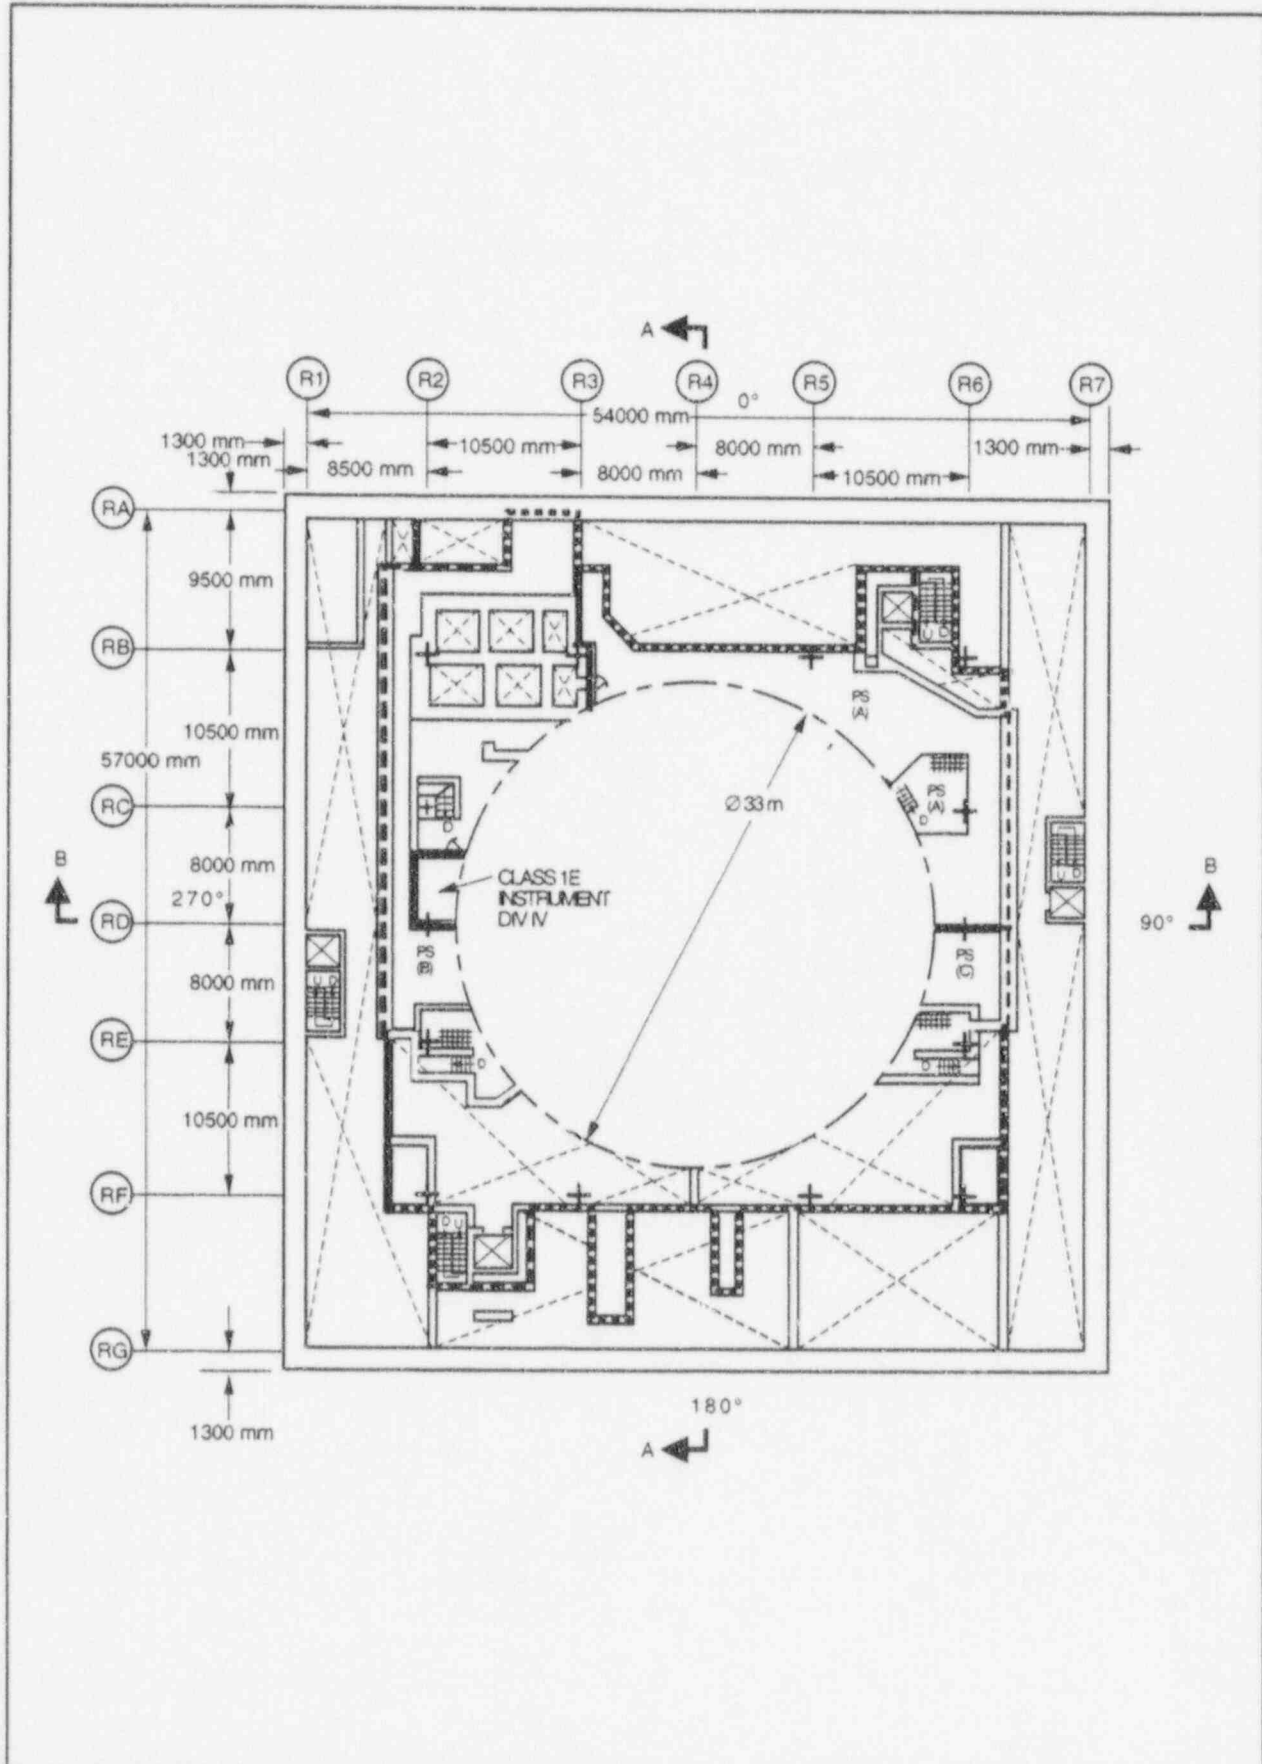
Reactor Building Arrangement—Elevation 8500 mm
